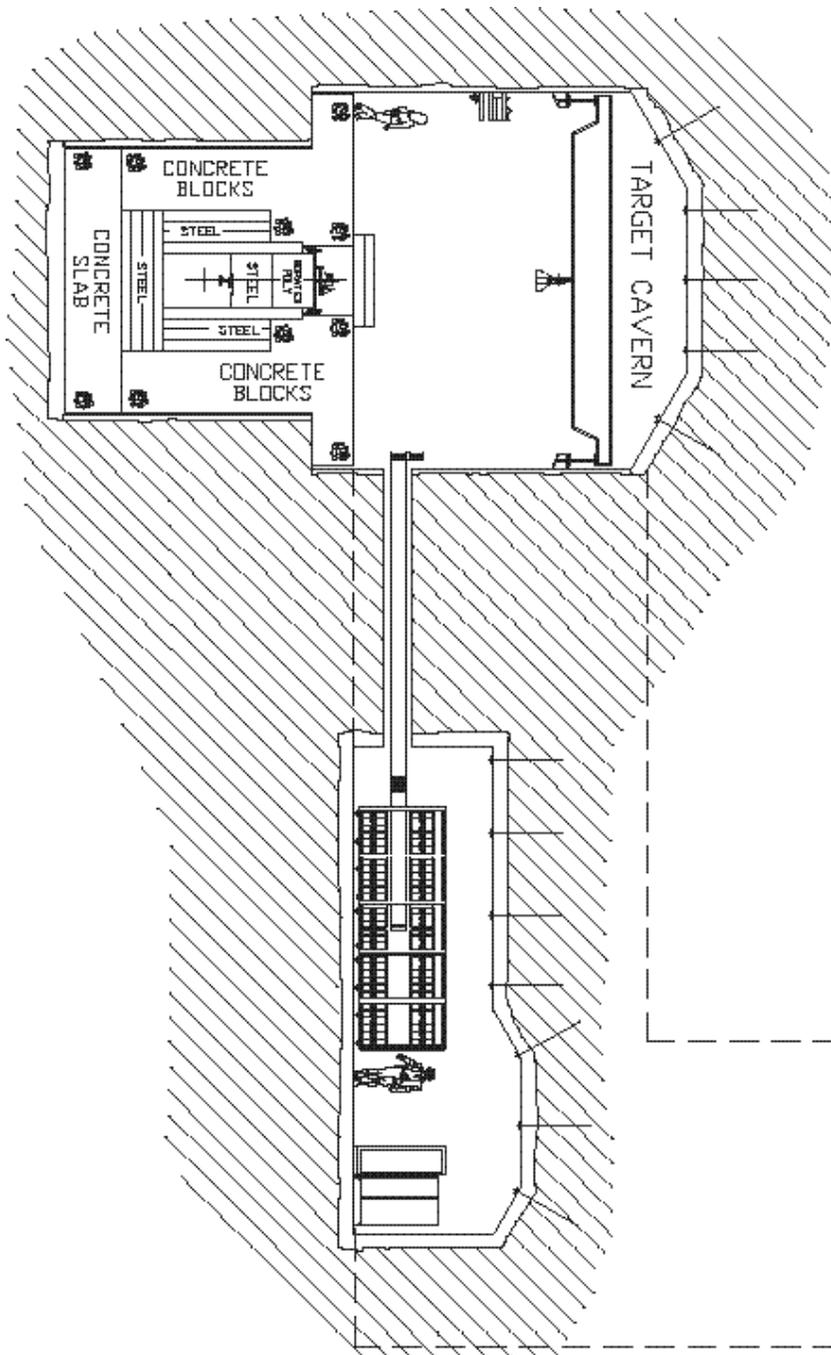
Target Hall and Power Supply Room Cross Section Conceptual Drawing
